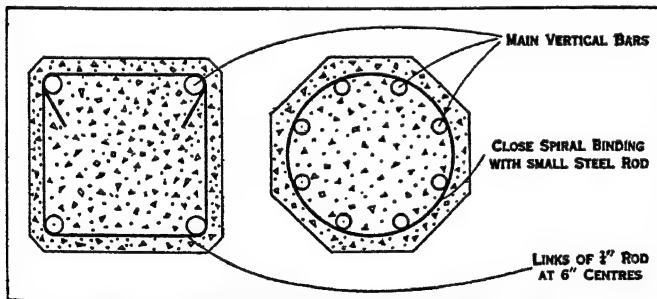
TYPICAL SECTIONS OF CONCRETE COLUMN
